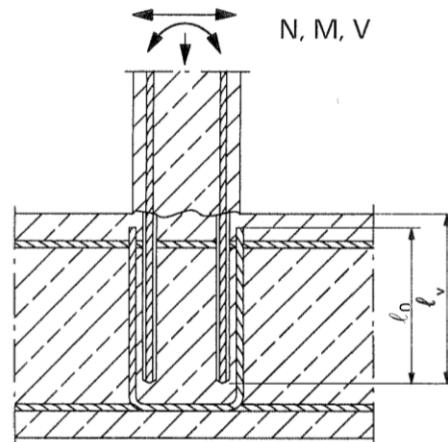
Rebar connection for components stressed primarily in compression. The rebars are stressed in compression
